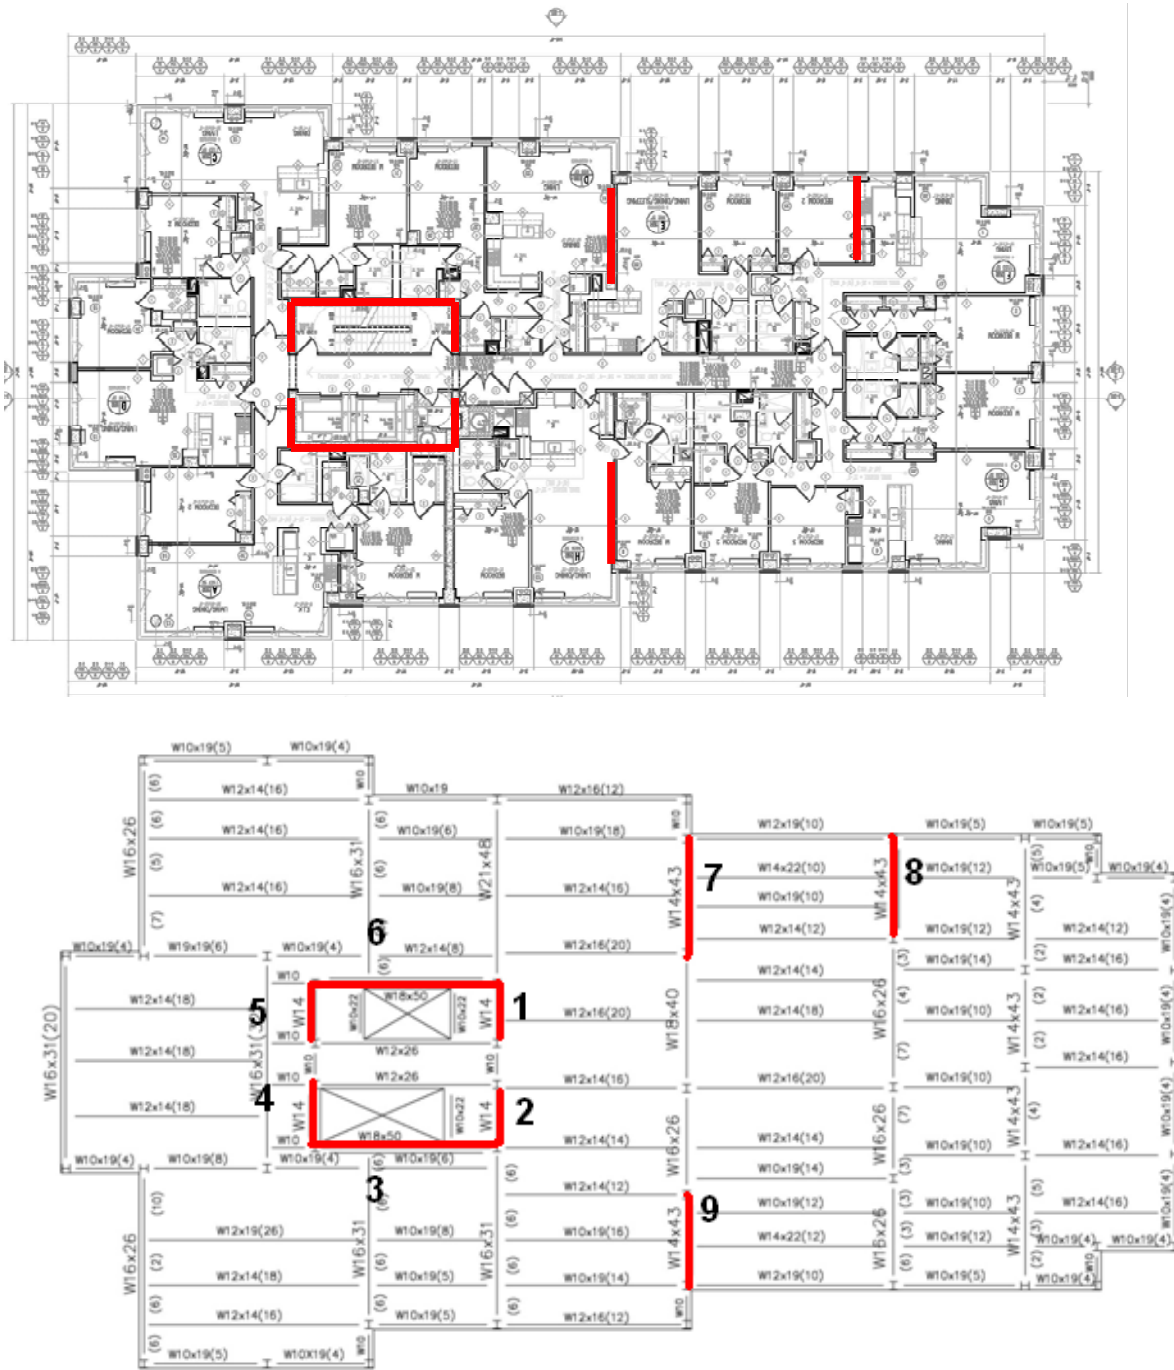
Above, the architectural floor plan can be seen with existing room layouts and partition walls. Below, a typical structural floor plan utilizing Girder-Slab floor system. Braced frame lateral systems are highlighted in red. Numbers correspond to frame number.
